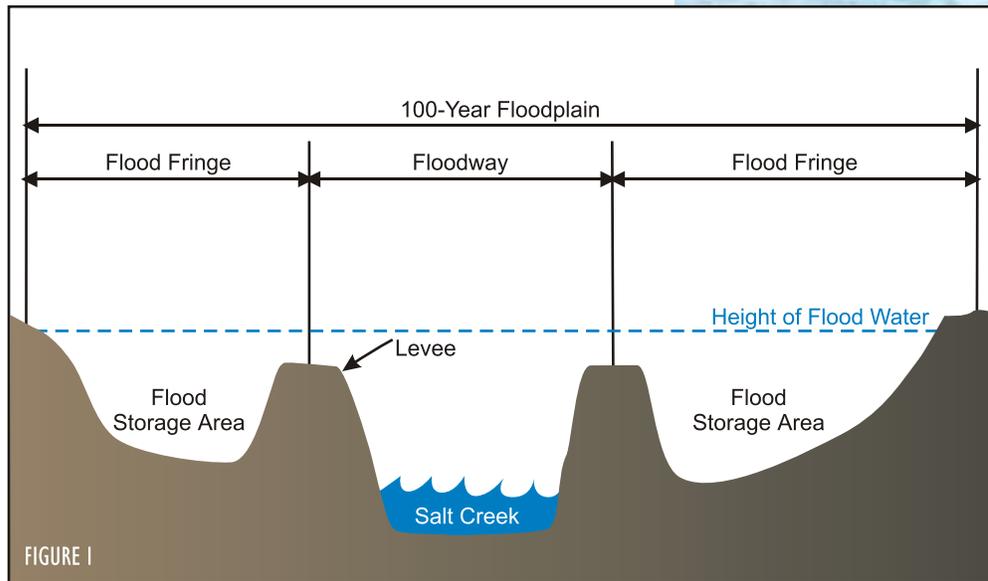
shows a typical cross section of the Salt Creek channel, Flood Storage Areas behind the levee and Floodplain limits.
